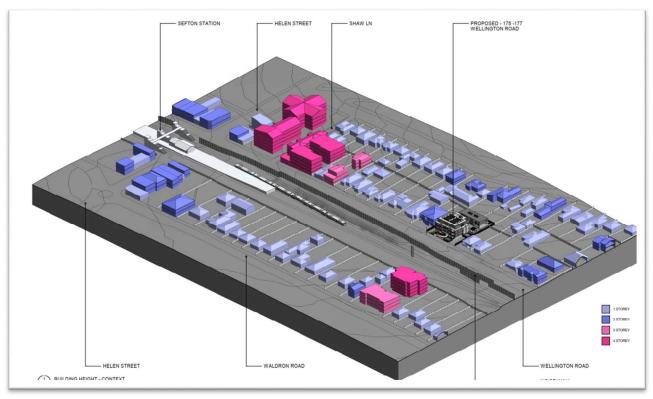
Analysis of building heights surrounding the site (Source: Shake Up Architecture)
